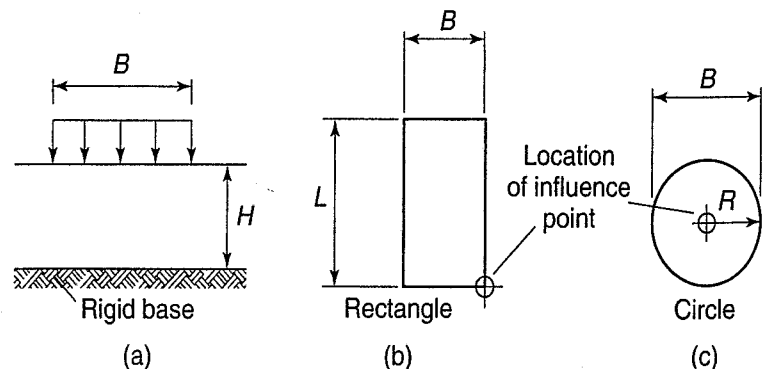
Notation for dimensions of loaded areas: (a) profile view; (b) rectangular loaded area in plan; and (c) circular loaded area in plan (after U.S. Navy, 1986).
